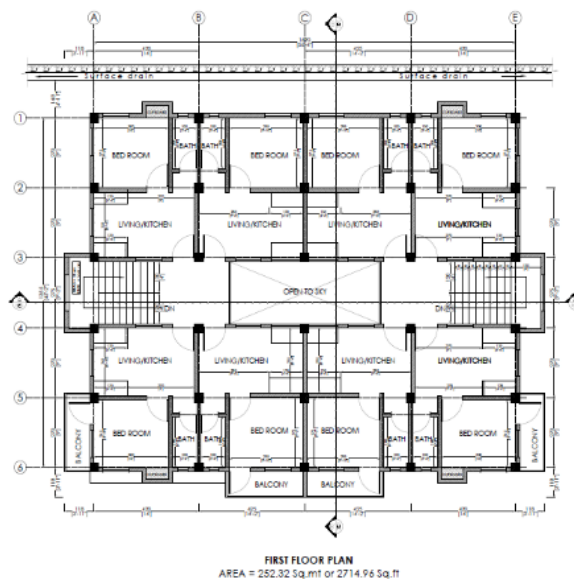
Floor plan (Khlainbok Jyrwa) [9]
